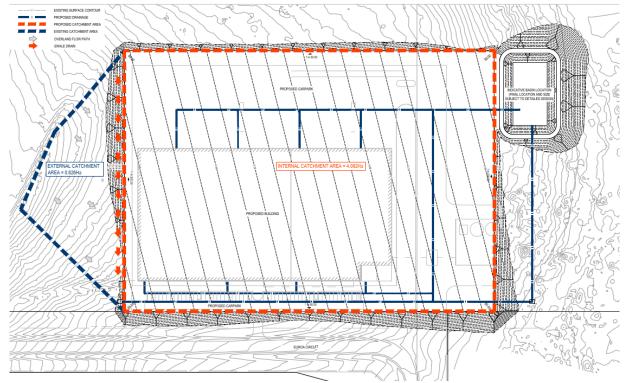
Storm Water Concept Plan (Source: SMEC, 2021)
